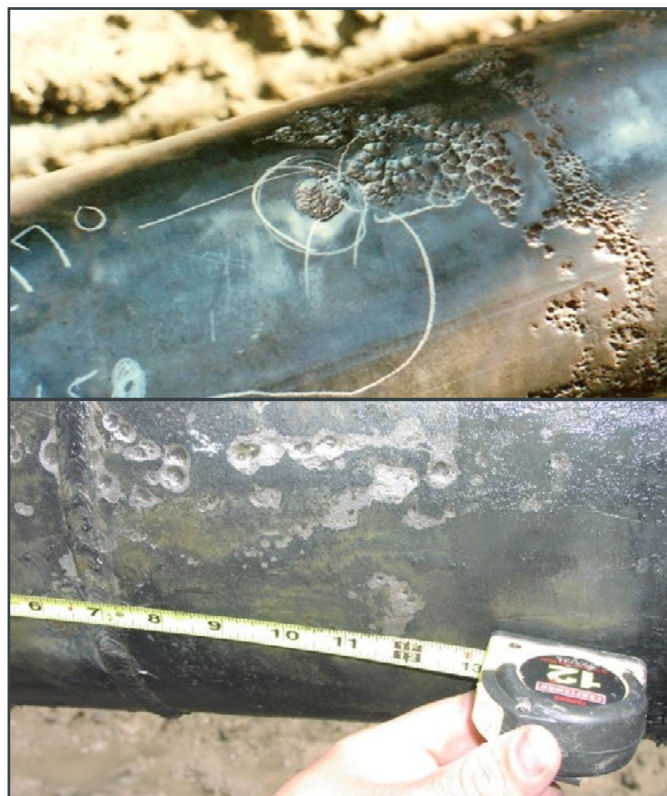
Above: Pitting corrosion occurs on field applied coating: The second Picture shows the distance from the weld bead
